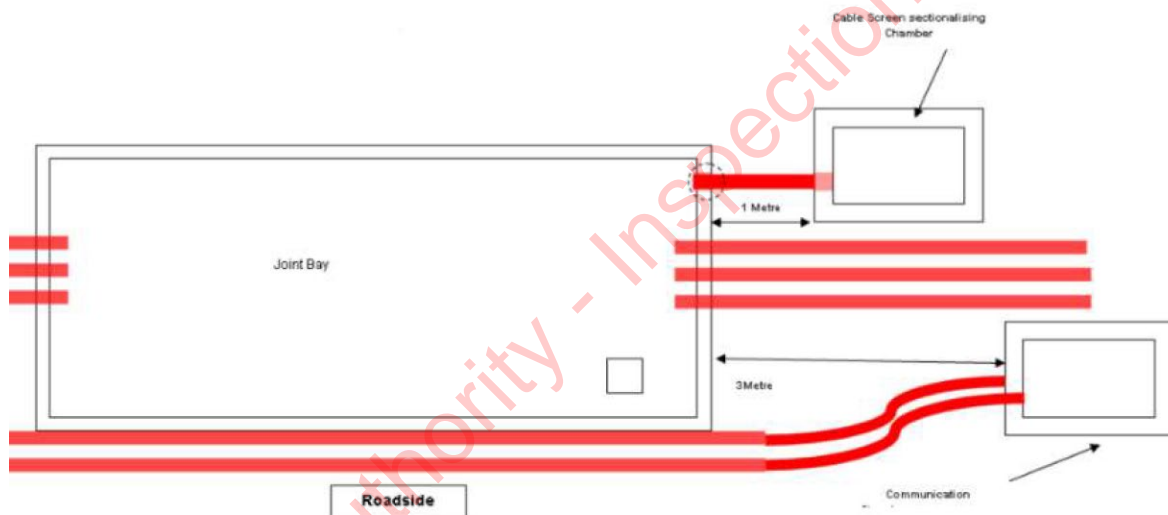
Typical Joint Bay and Link Box Plan Details
